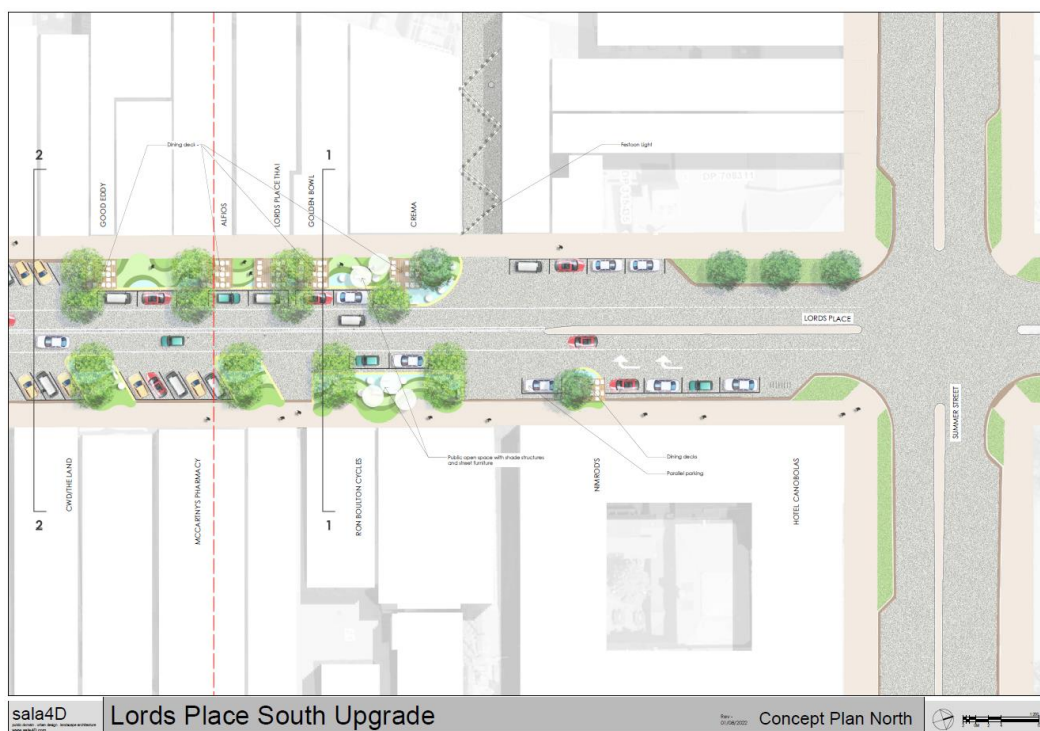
Lords Place South Upgrade Design Concept – Summer Street section
